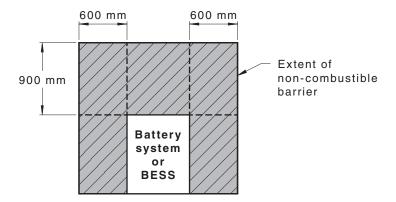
Barrier zones for battery systems or BESS installed on or near a habitable room facing wall
